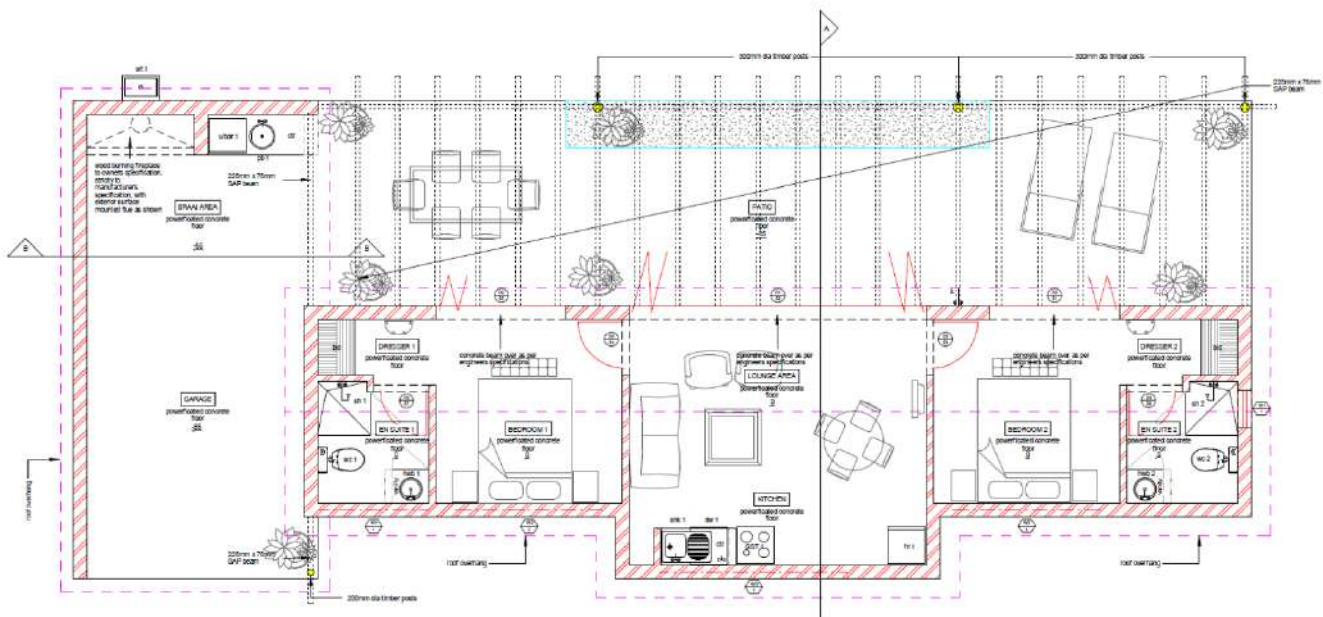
Plans showing renovations- Dwelling 2 (adapted from Vatelier Plancad – Appendix J)
